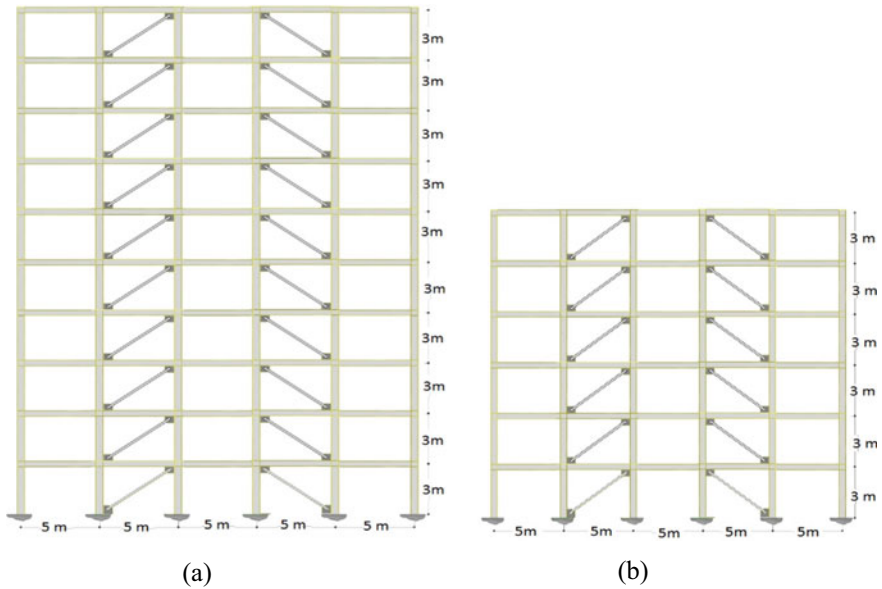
Braced frame plan (Hosseini Hashemi et al. 2016)
